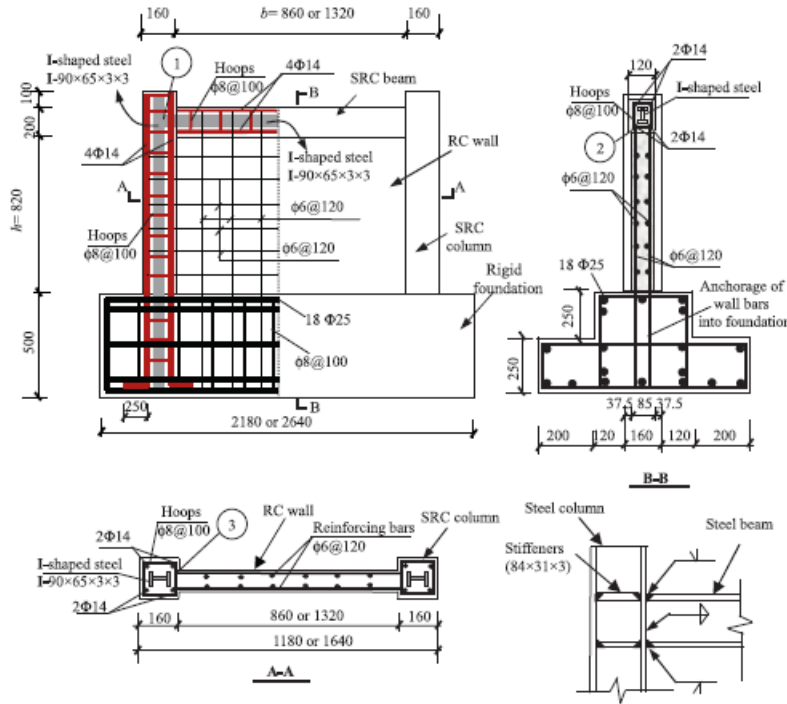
Tested Specimen with Steel Boundary Elements, Liao et al. (2012)
